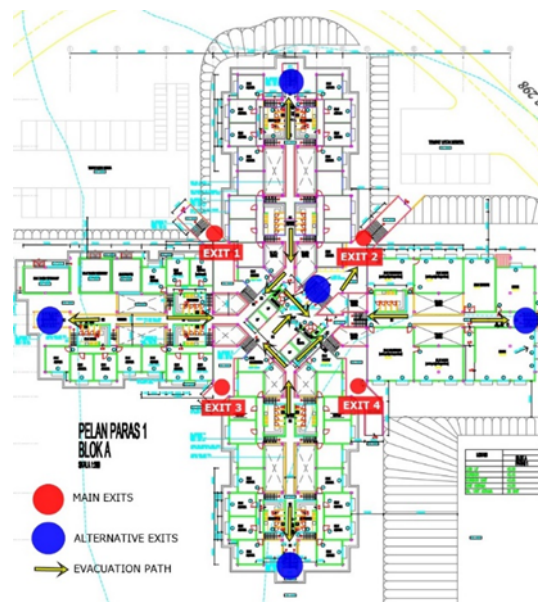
Shows floor plan Desasiswa Restu (M01) has 9 total exits with a 10m minimum exit distance
